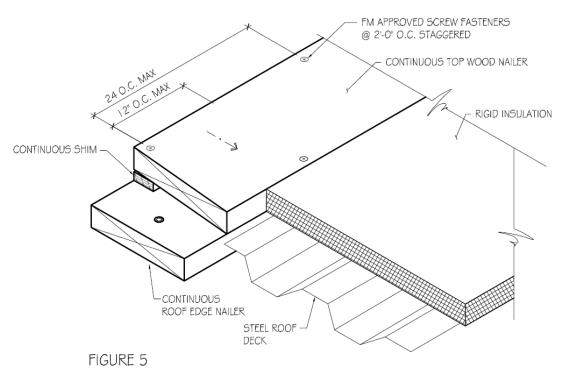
B - TYPICAL ROOF EDGE WOOD BLOCKING - SCREW FASTENER ANCHORAGE
